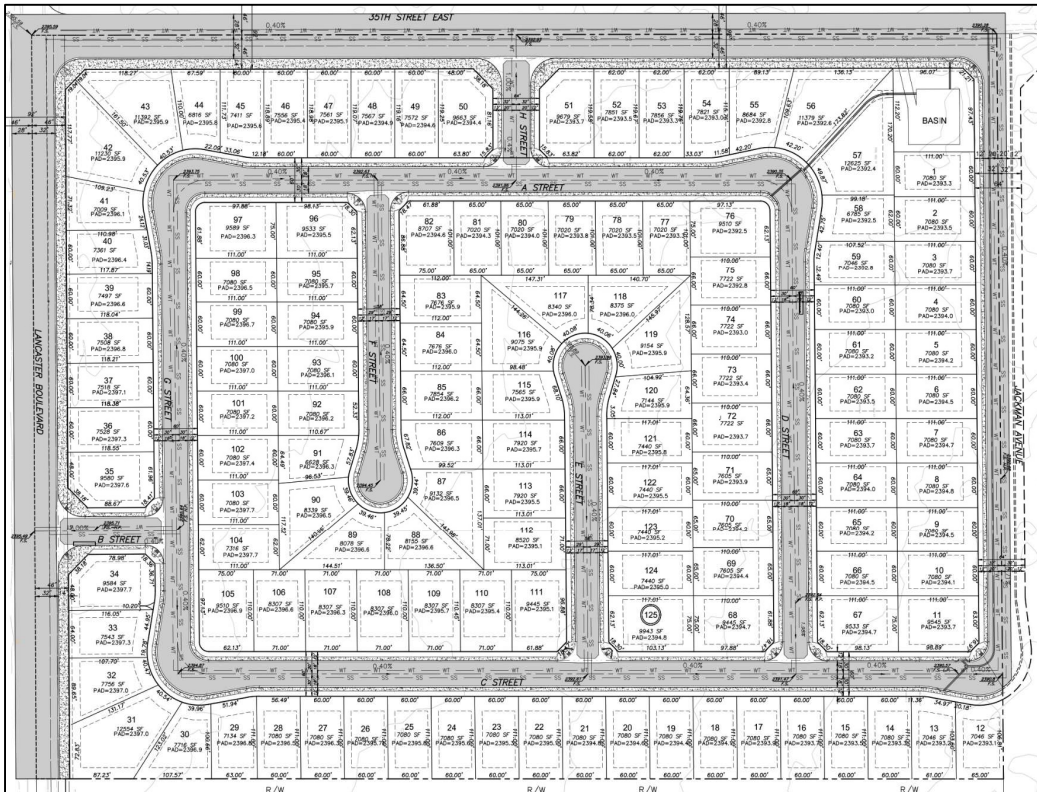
Site Plan – Proposed Housing Development - TTM 83572, Lancaster, CA
